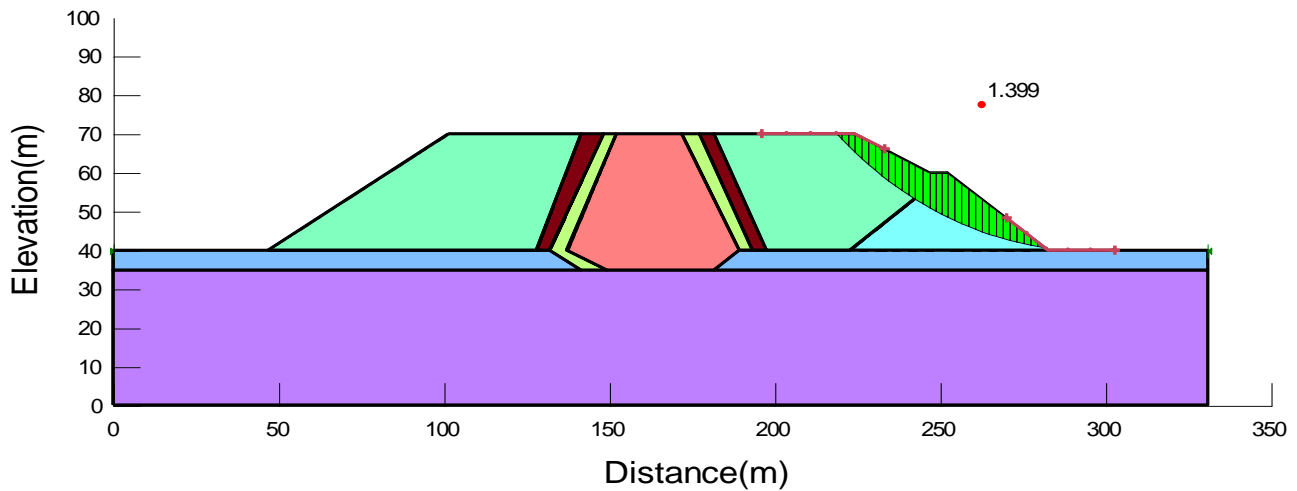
Slope Stability during construction with Earthquake CC (D/S)
